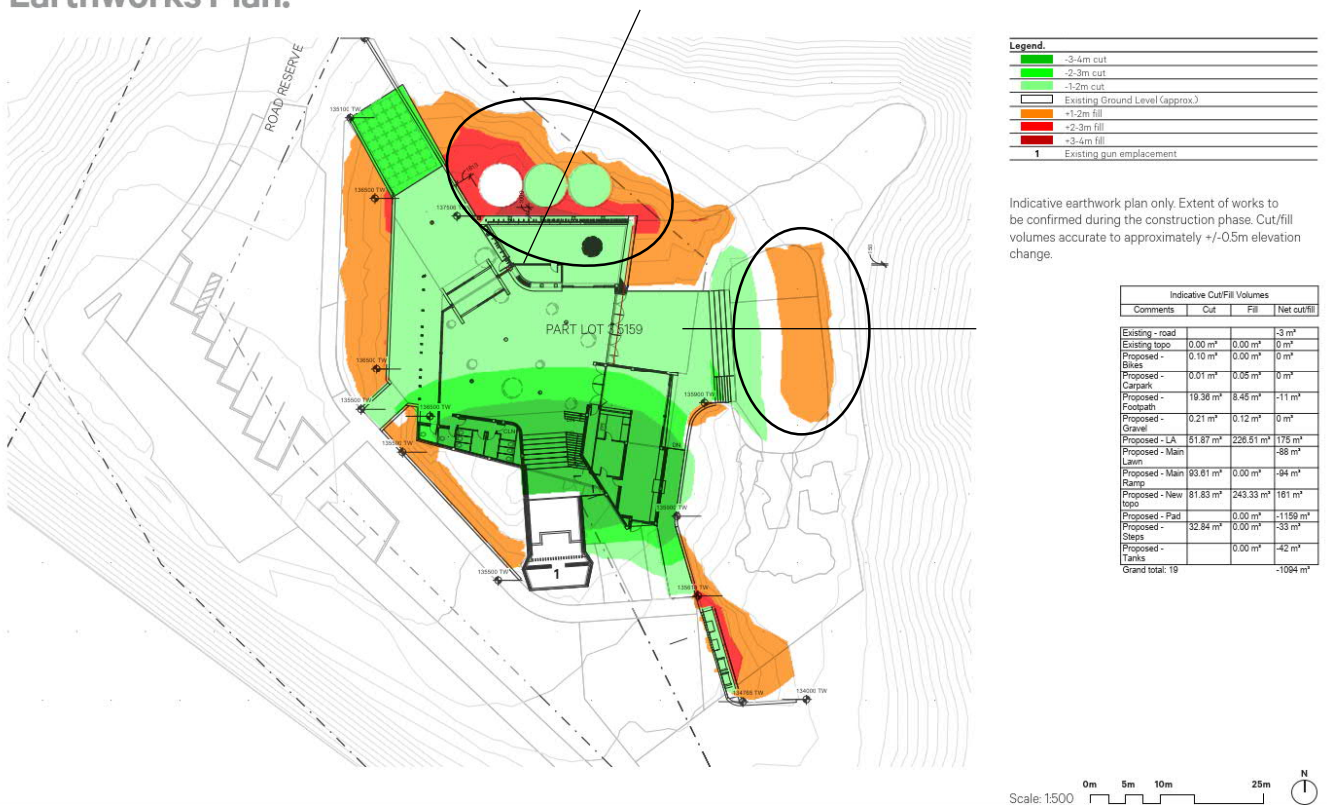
Annotated snip of Cut/Fill earthworks Plan showing areas of filling (ovals) requiring geotechnical stability consideration and indicative cross sections (lines). Source: Isthmus Architects.
